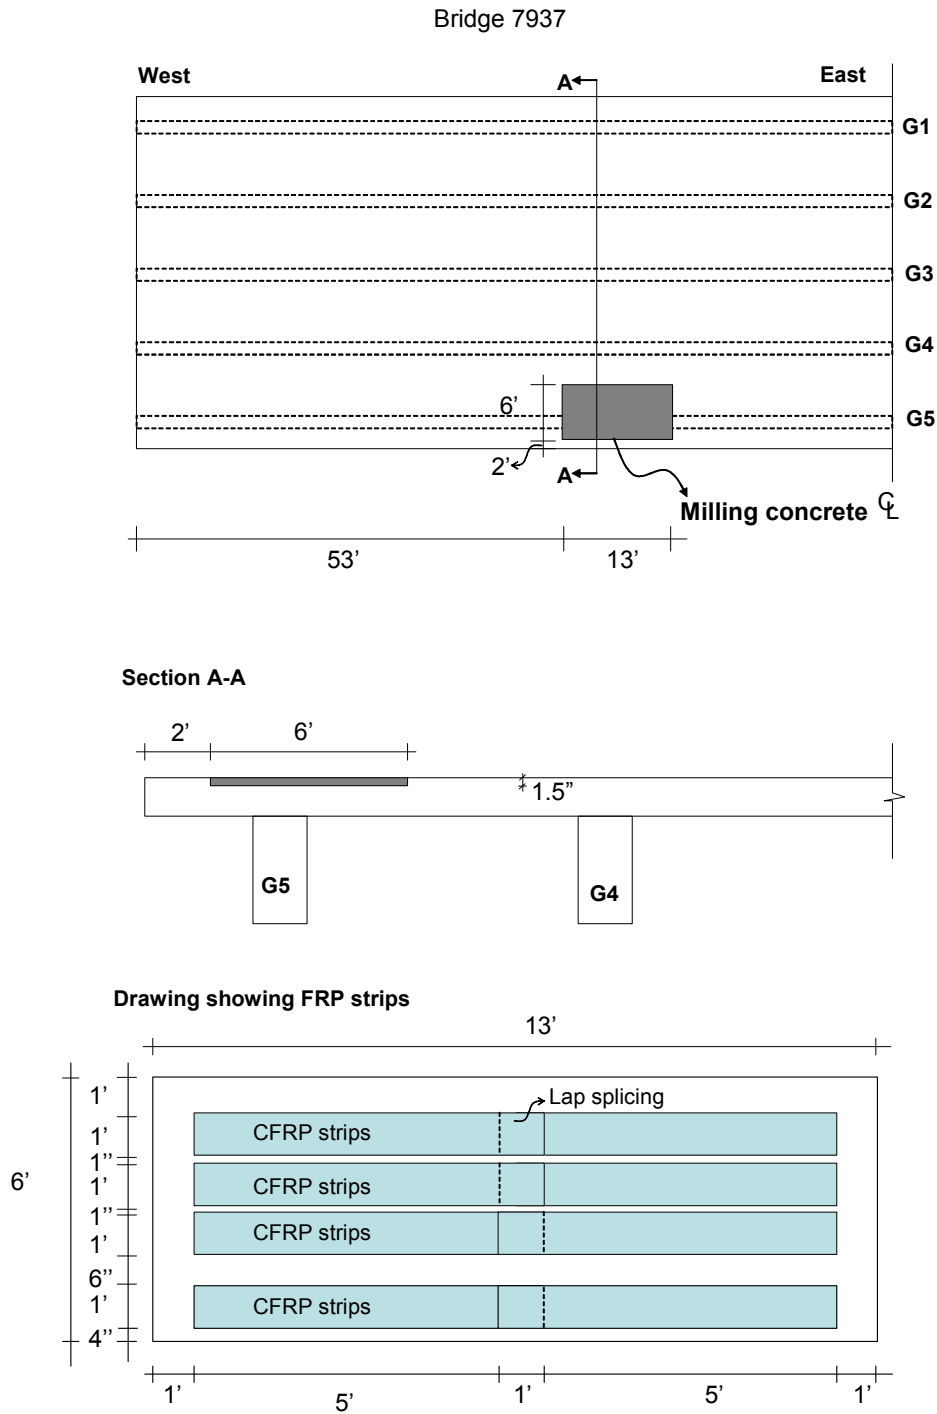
Schematic figure shows the layout of four CFRP strips for strengthening the exterior girder of Bridge 7937.
